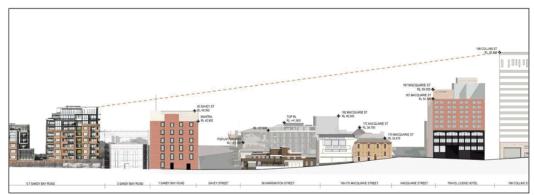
The proposed development inserted into the background of the Sandy Bay Road/Harrington Street streetscape context (Source: JAWS Architects).
